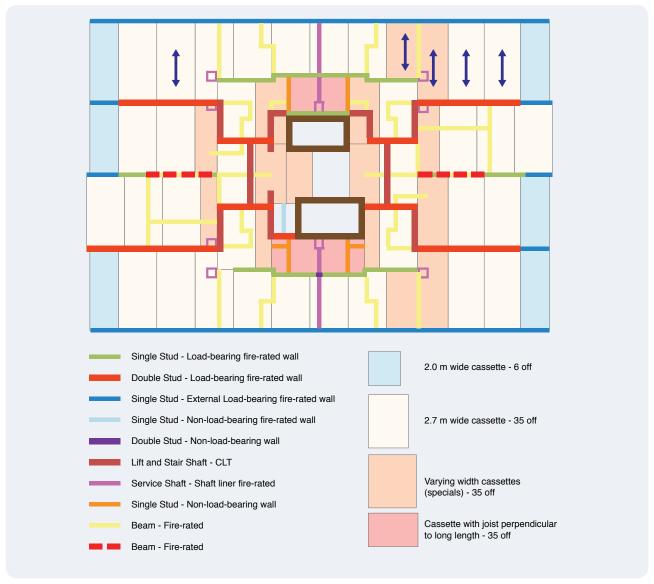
Example of load-bearing walls and floor cassette layout.
